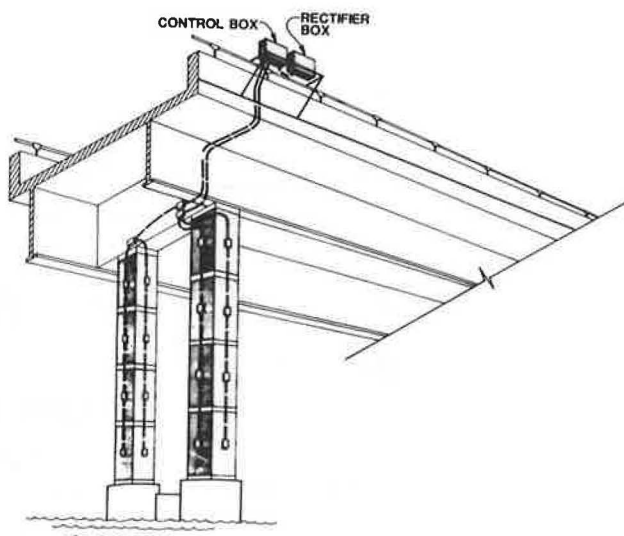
Pier 4, Richmond-San Rafael Bridge.
